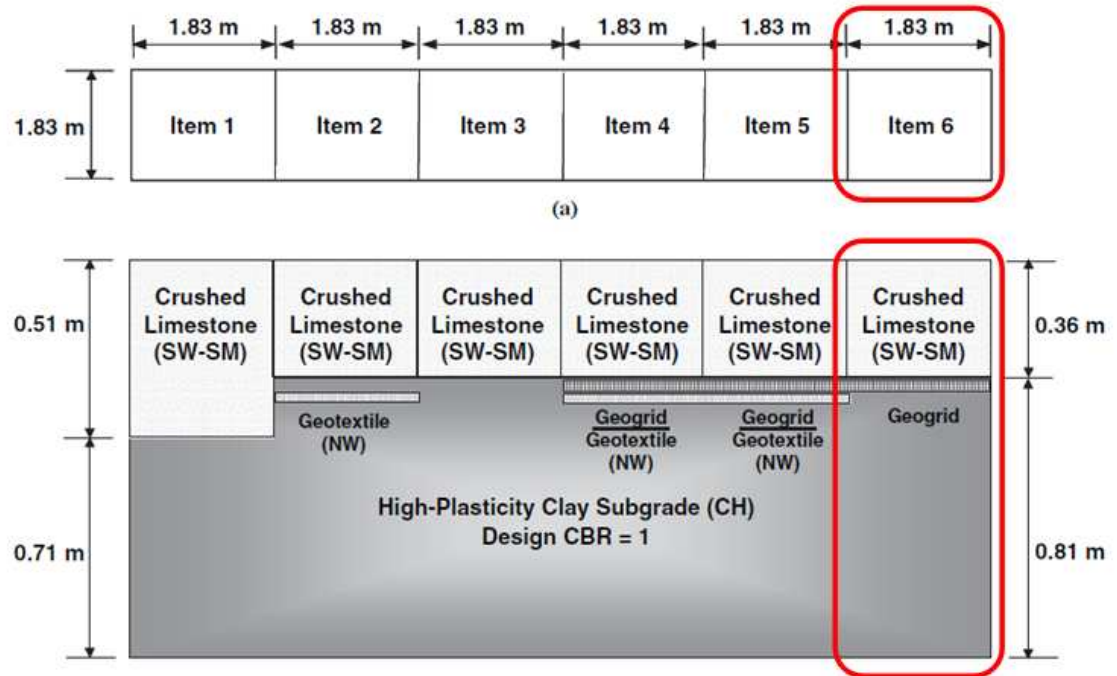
Laboratory pavement test items: (a) plan and (b) profile layout (Tingle and Jersey 2005)
